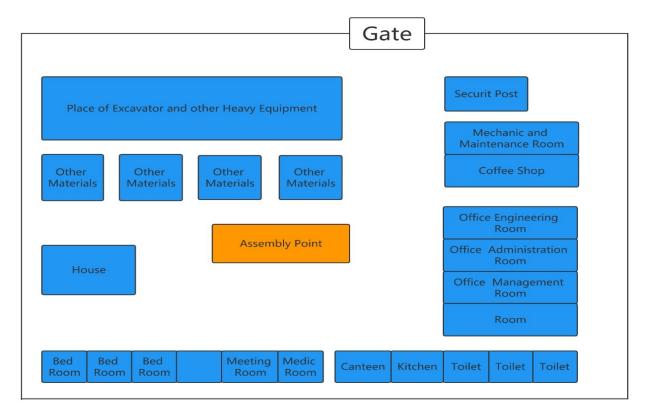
Location of Road Rehabilitation Works Construction Camp
